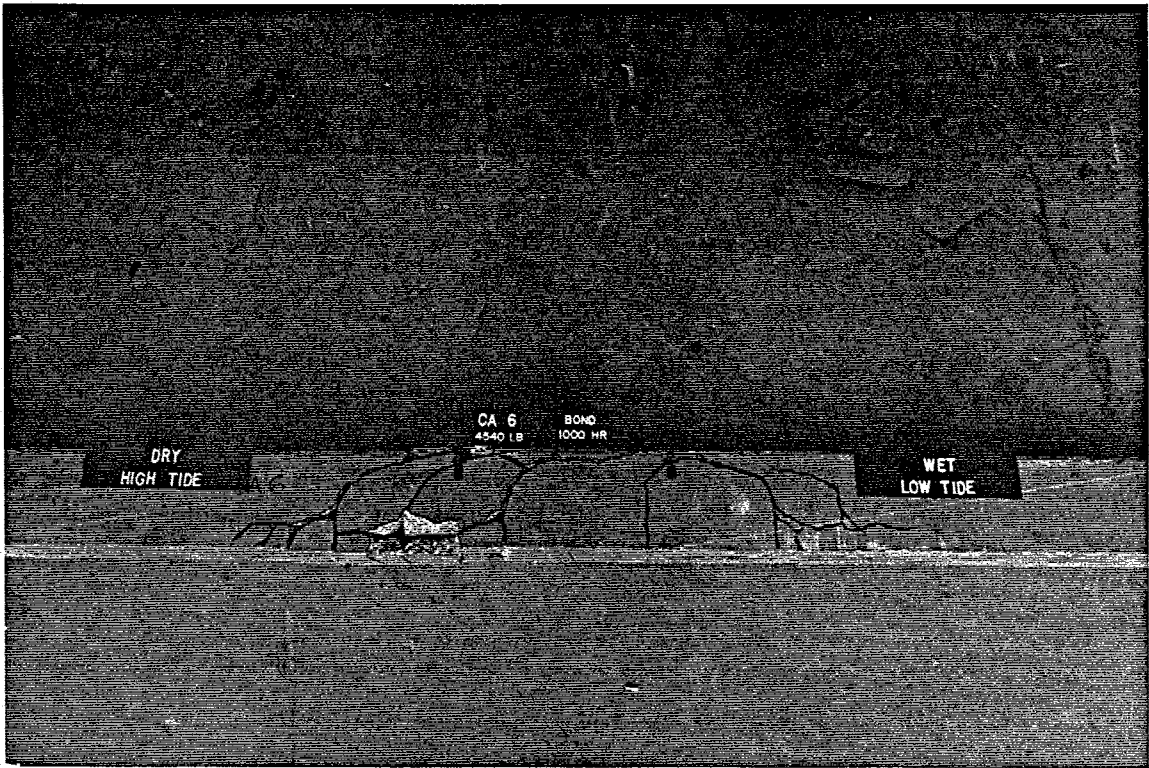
Crack Pattern for Beam CA 6 - Tested After 1,000 Hours
